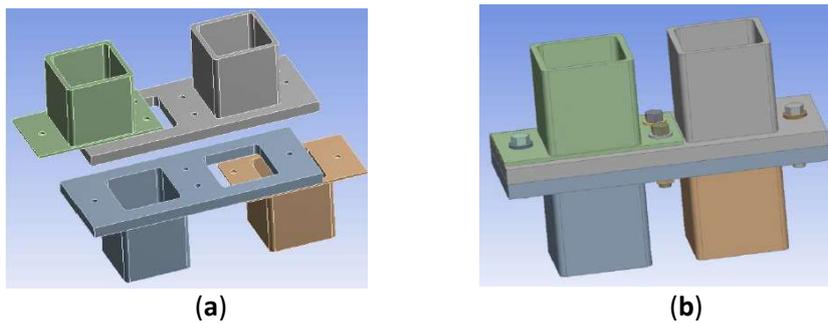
Gunawardena Joint 3D schematizations: (a) Order of module installation, (b) Post installation and bolting (Gunawardena et al, 2016).
